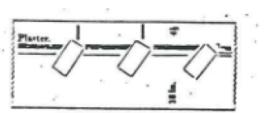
Diagonal Tying Brick [Specifications 1874]
